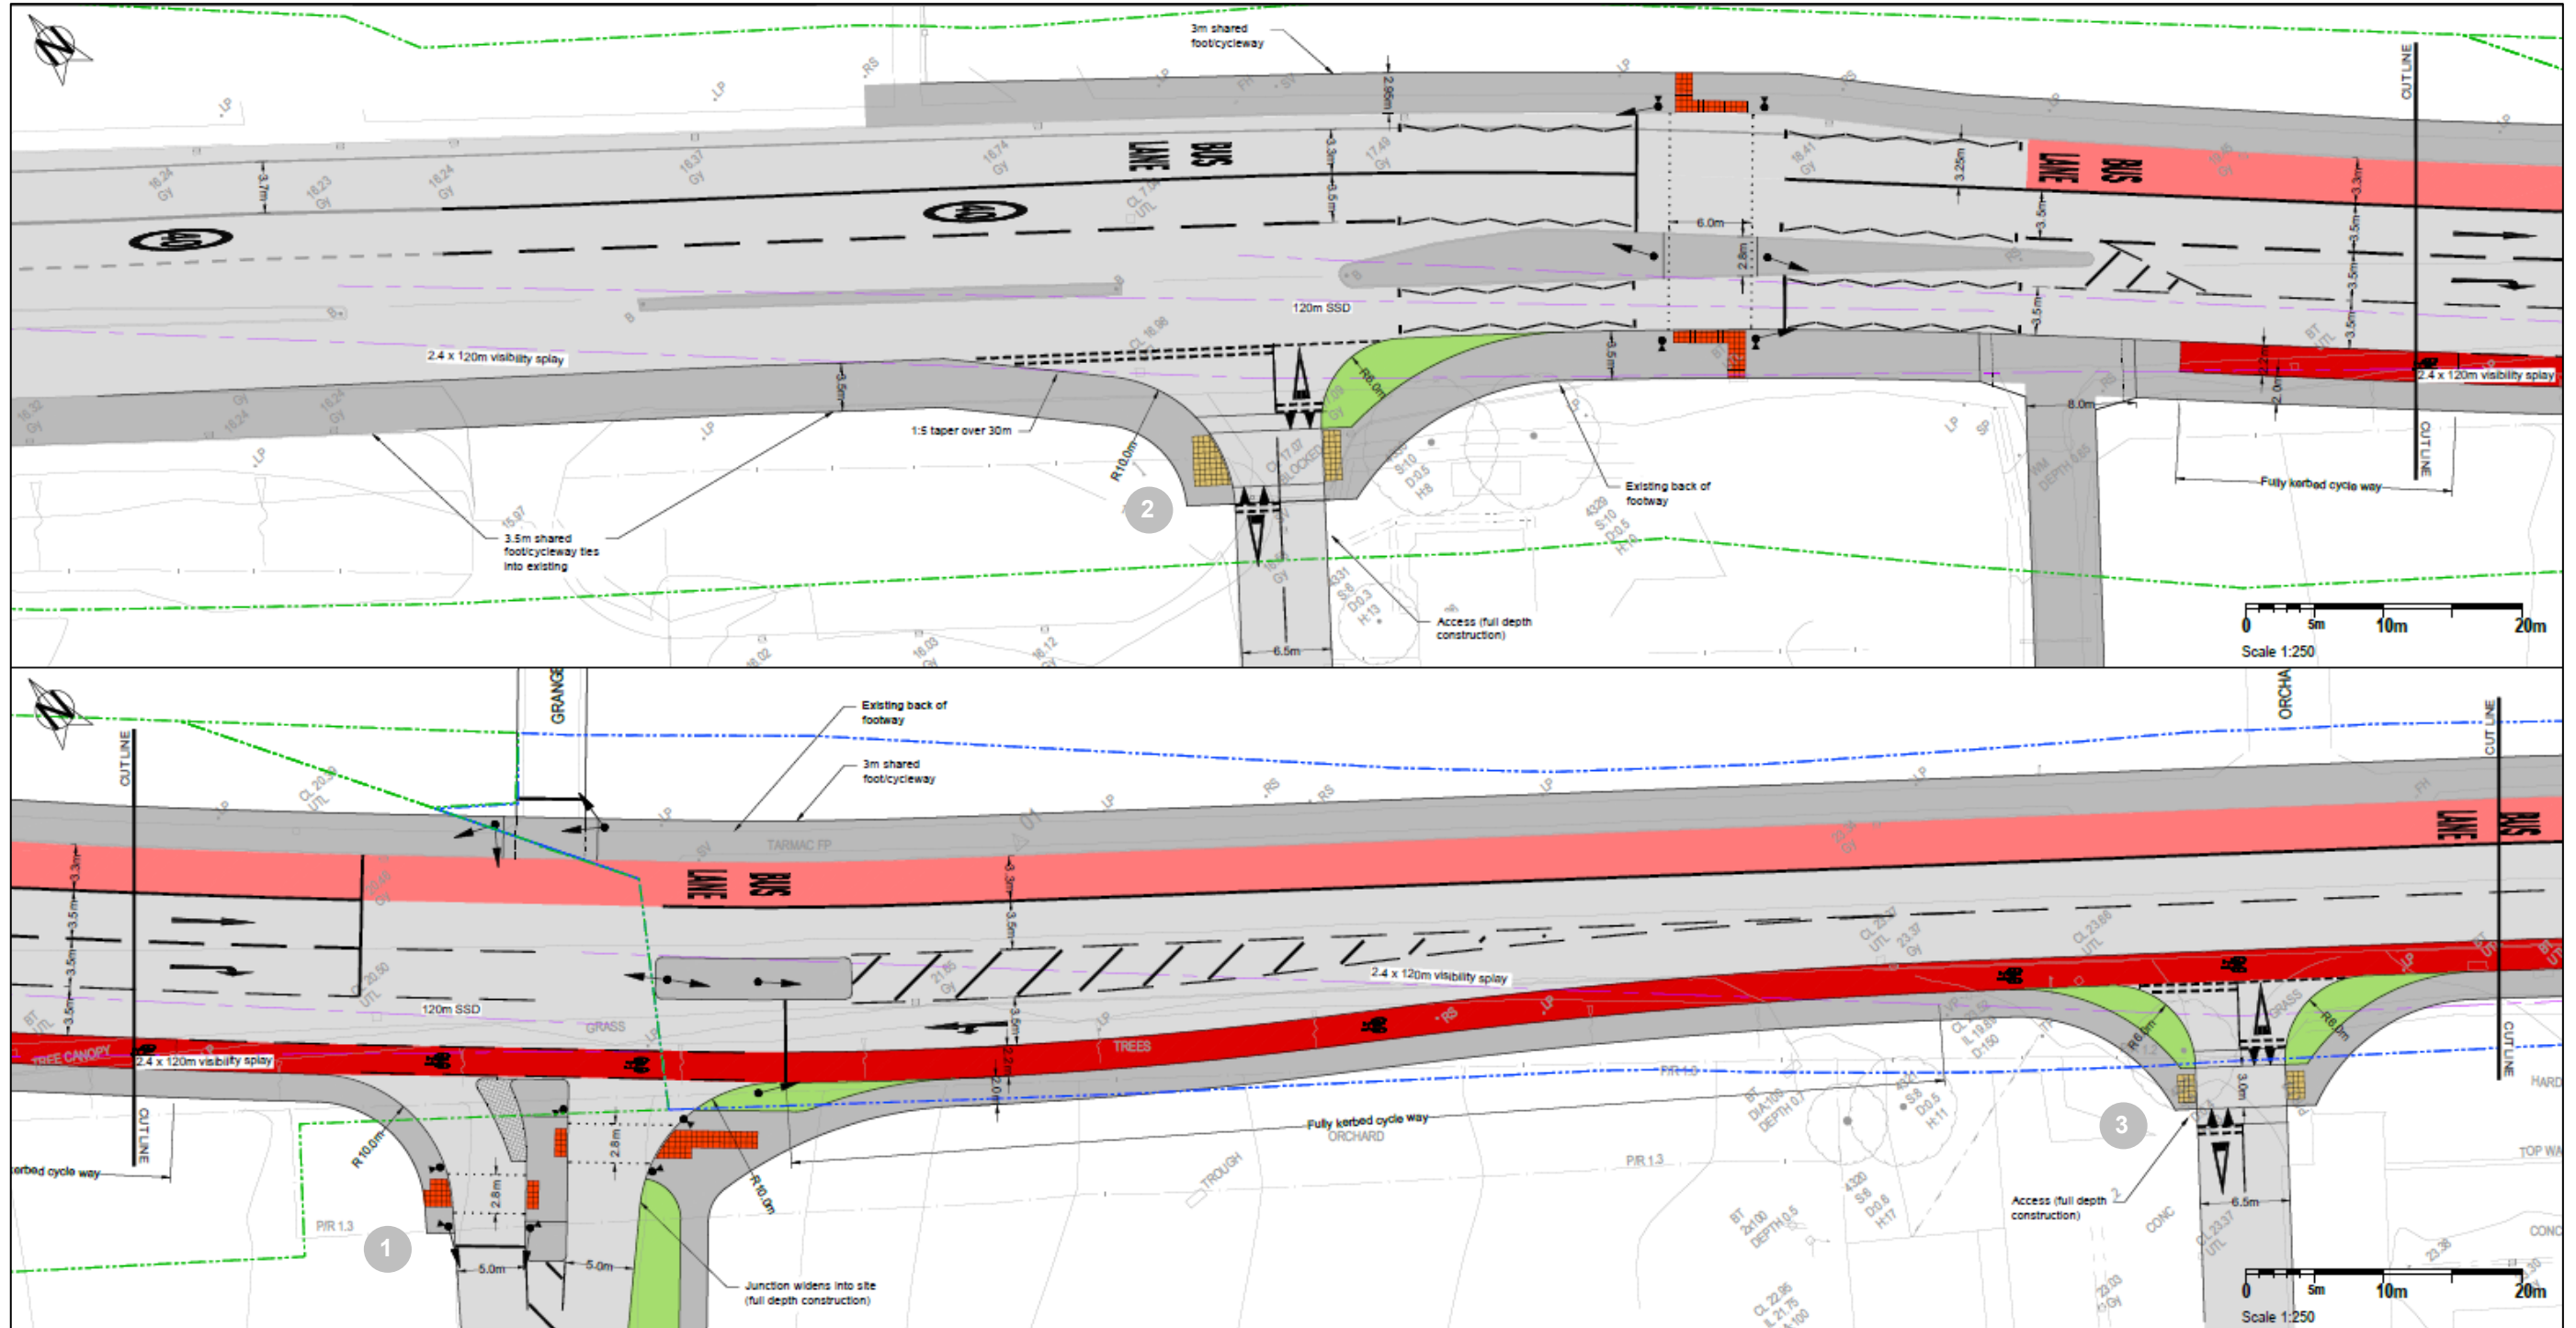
Detailed Access Plan (Huntingdon Road (A1307))
